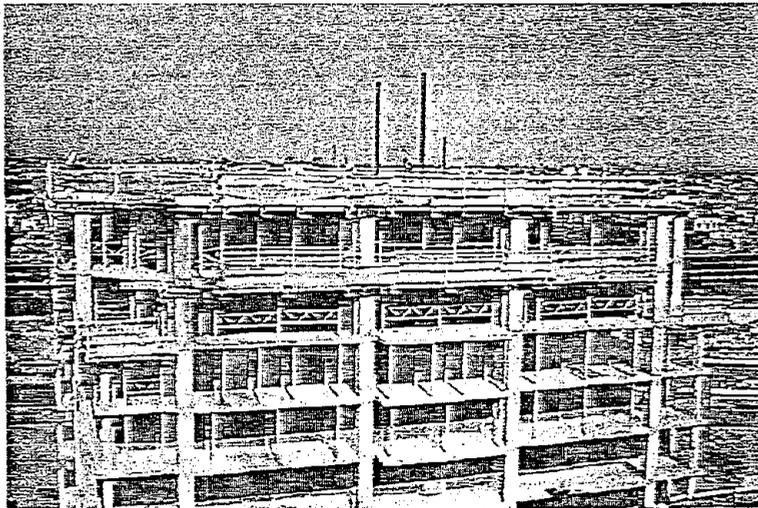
View of the North Tower as seen from the top of the South Tower. The four floors of PERI shoring are readily visible.
